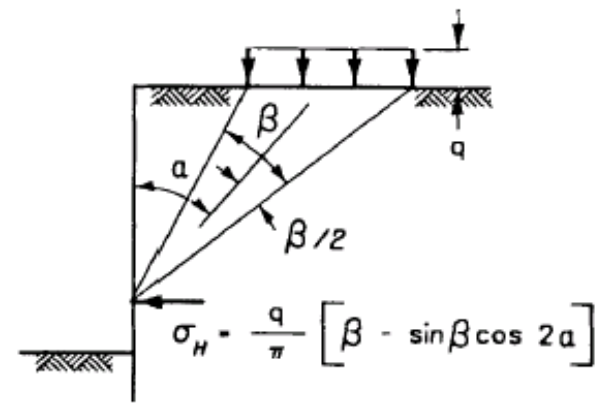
Proposed retaining wall with surcharge load for Example 23.6.
